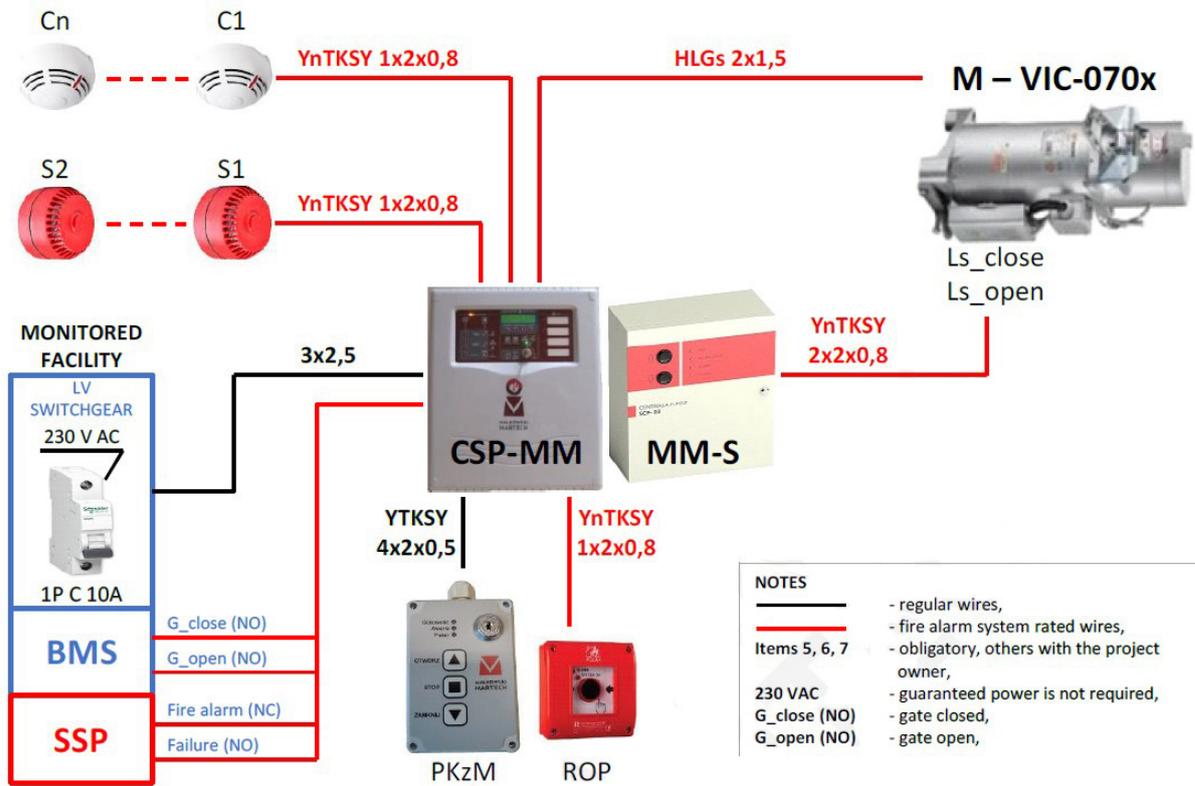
control system with externally-mounted 24 V DC drive unit
